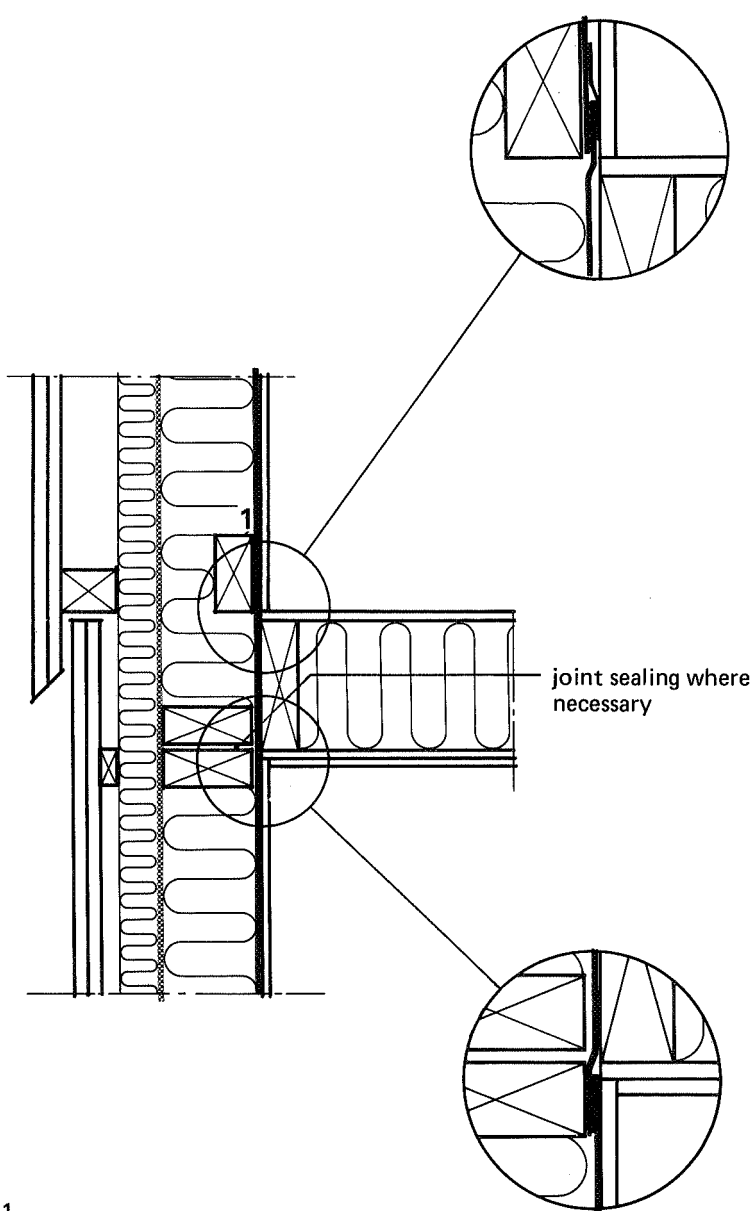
A joint between gable head, gable wall and intermediate joist structure in the case of a wall construction with »external» mineral wool slab. When constructing the shell, a plastic foil strip is placed around the intermediate joist structure against which the wall foil can be sealed. The design and working procedure agree in principle with figure 54. This method is suitable when pre-fabricating gable heads.
